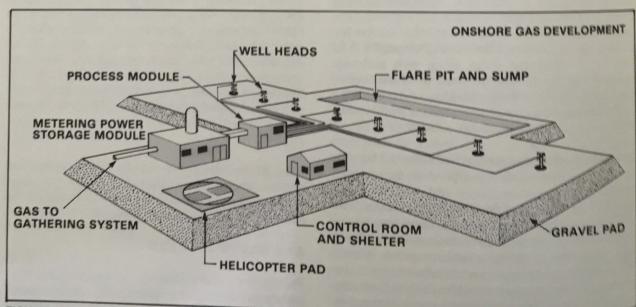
A well cluster site accommodating a test separator, metering facilities, storage tanks, emergency power units emergency shelter and production control equipment.
